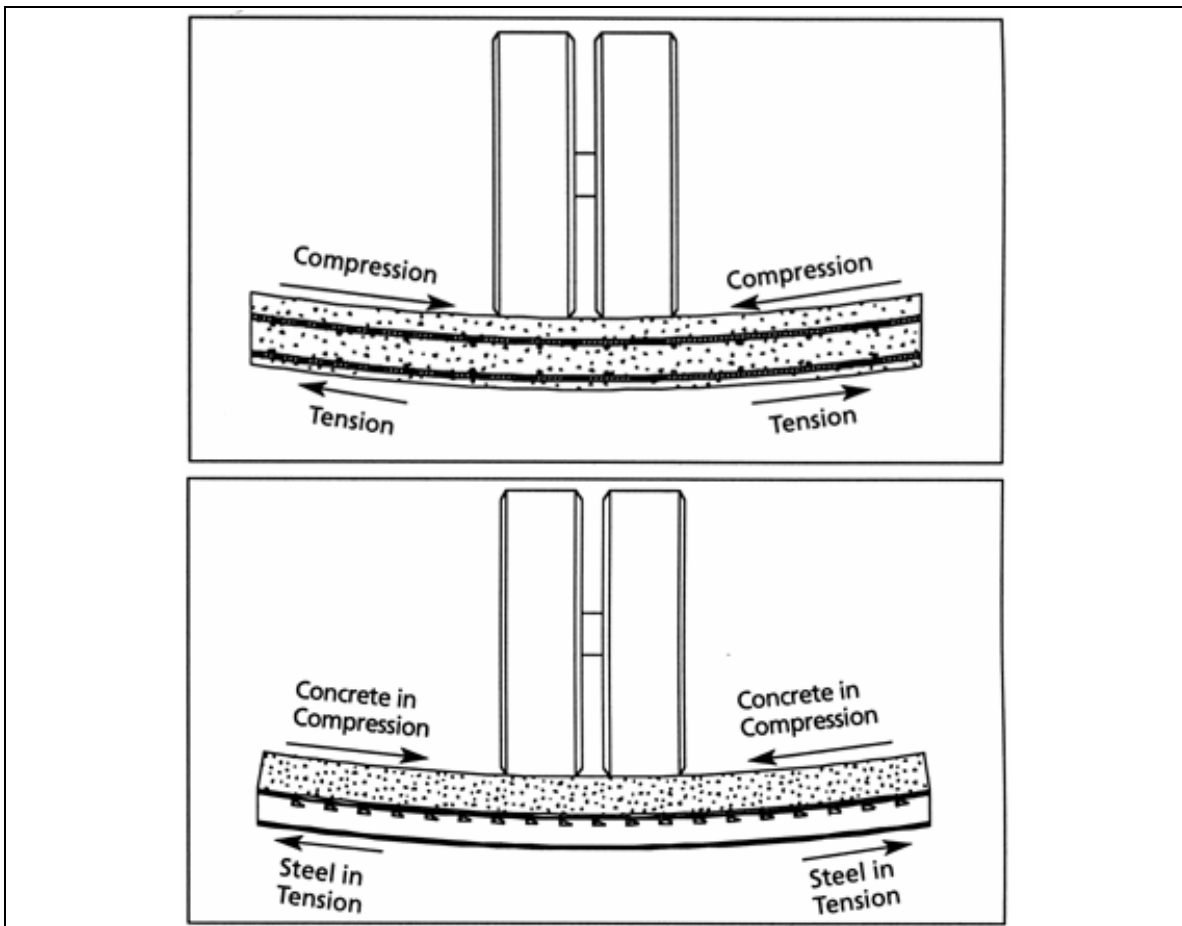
Standard concrete slab and Exodermic deck in positive bending (Exodermic Bridge Deck, Inc., 1998)
